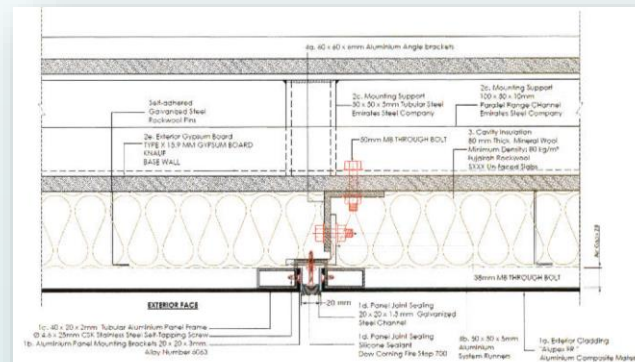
"Alupec FR" non-load-bearing exterior wall cladding Horizontal section details
